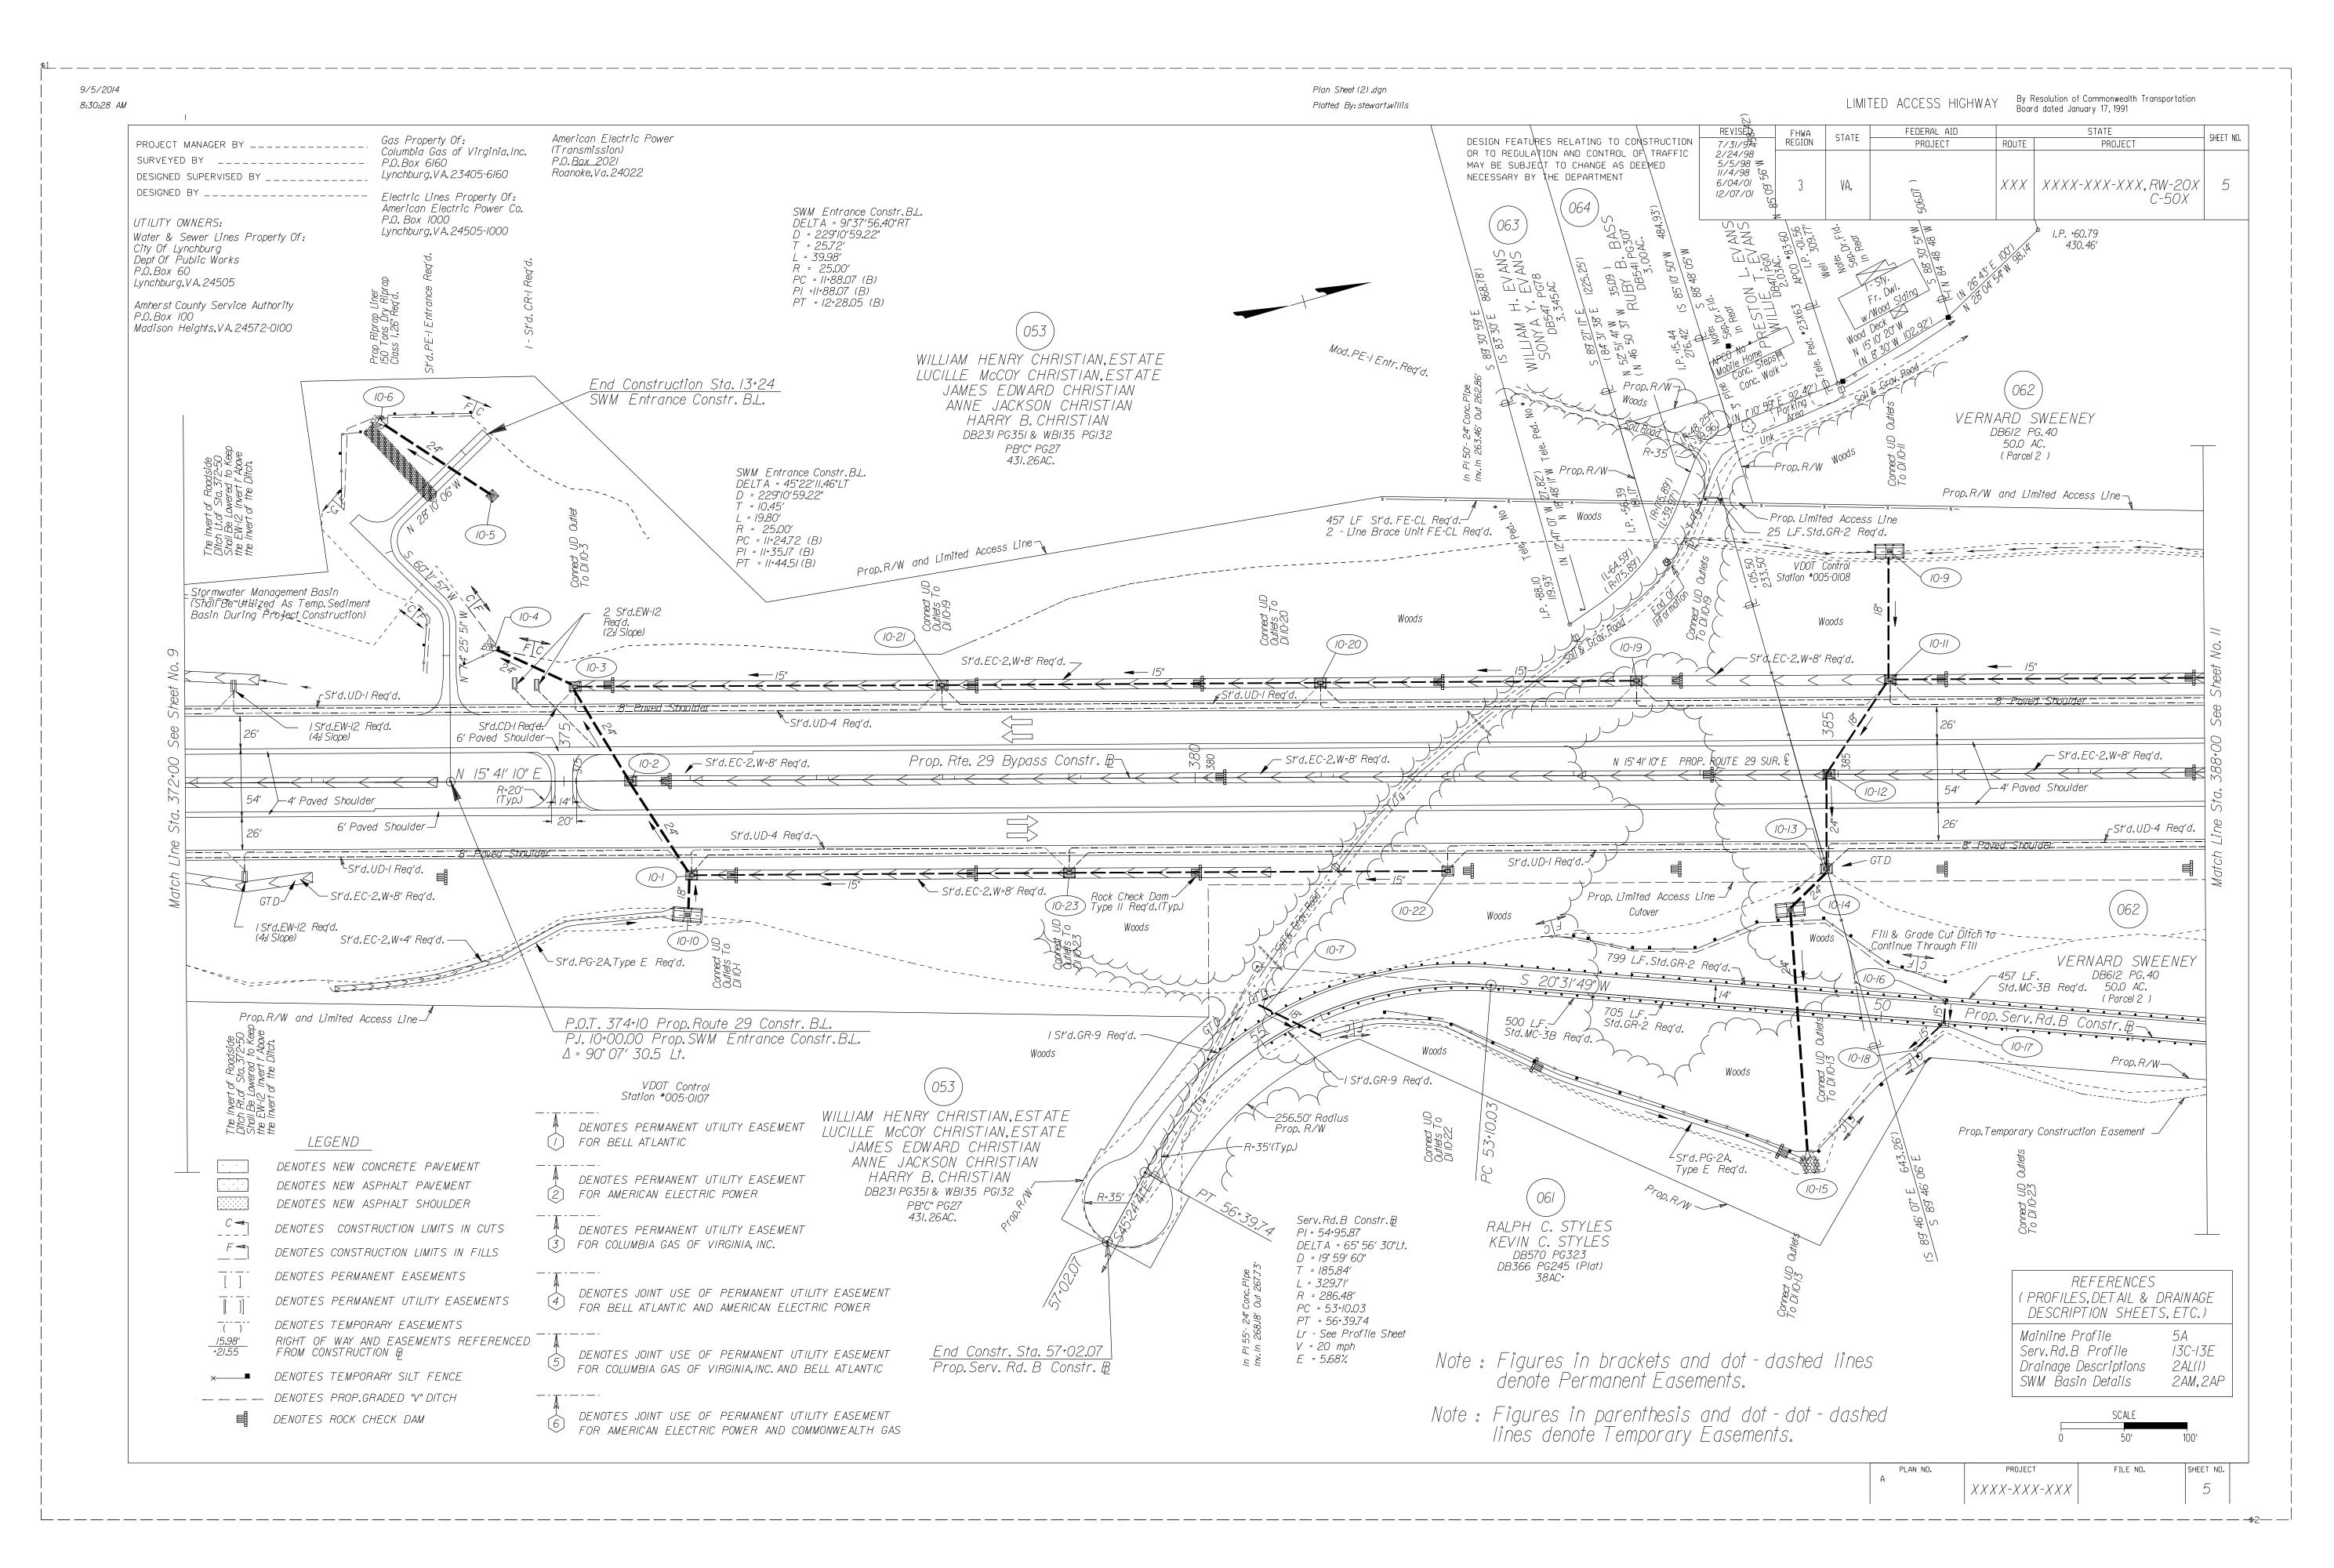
H - 32 SAMPLE 2 PLAN SHEET
